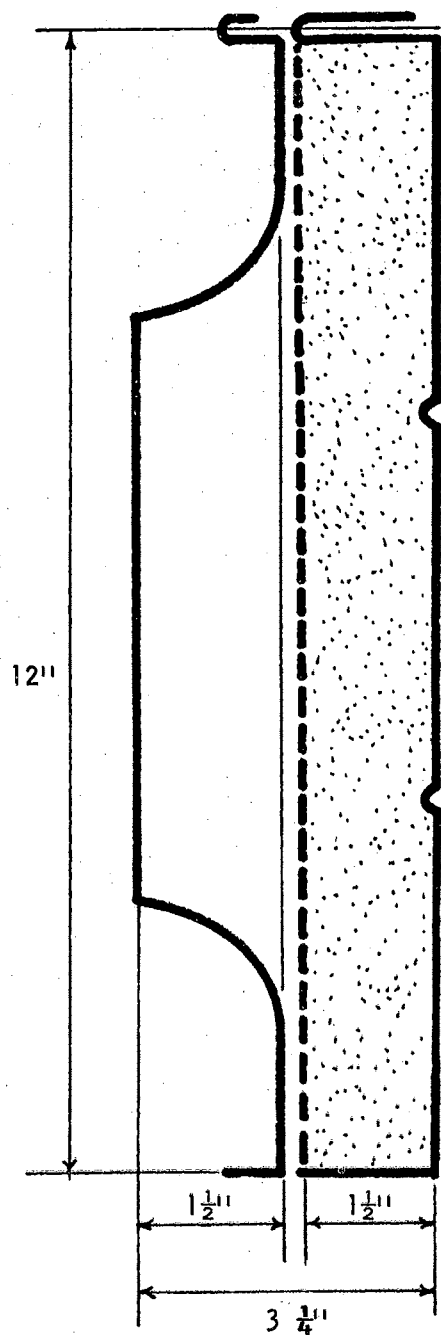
Metal Sandwich Panel Wall Section Utilized
